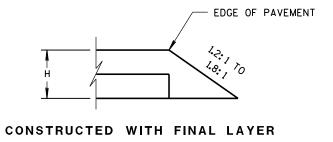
DETAIL B (BEAM GUARD AND TERMINAL SECTION NOT SHOWN)
